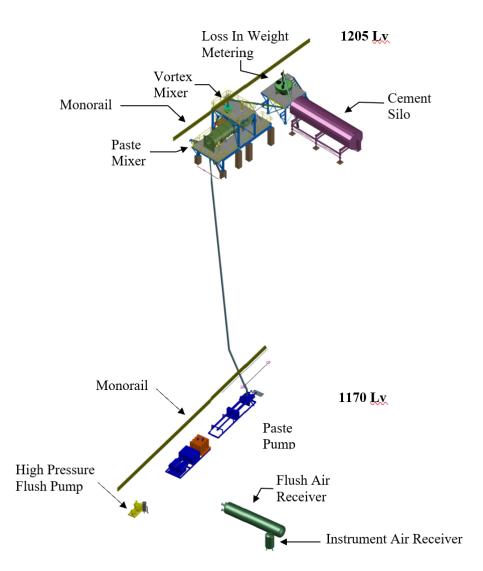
Schematic of Proposed Arrangement on 1205 and 1170 m Lv
